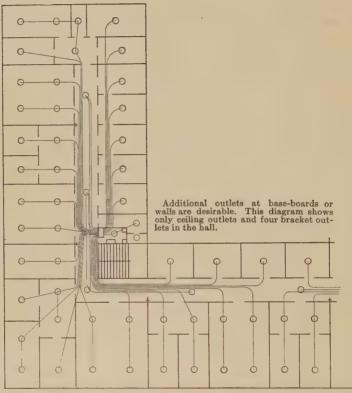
Conduit system for electric wiring for one floor of an office building.
